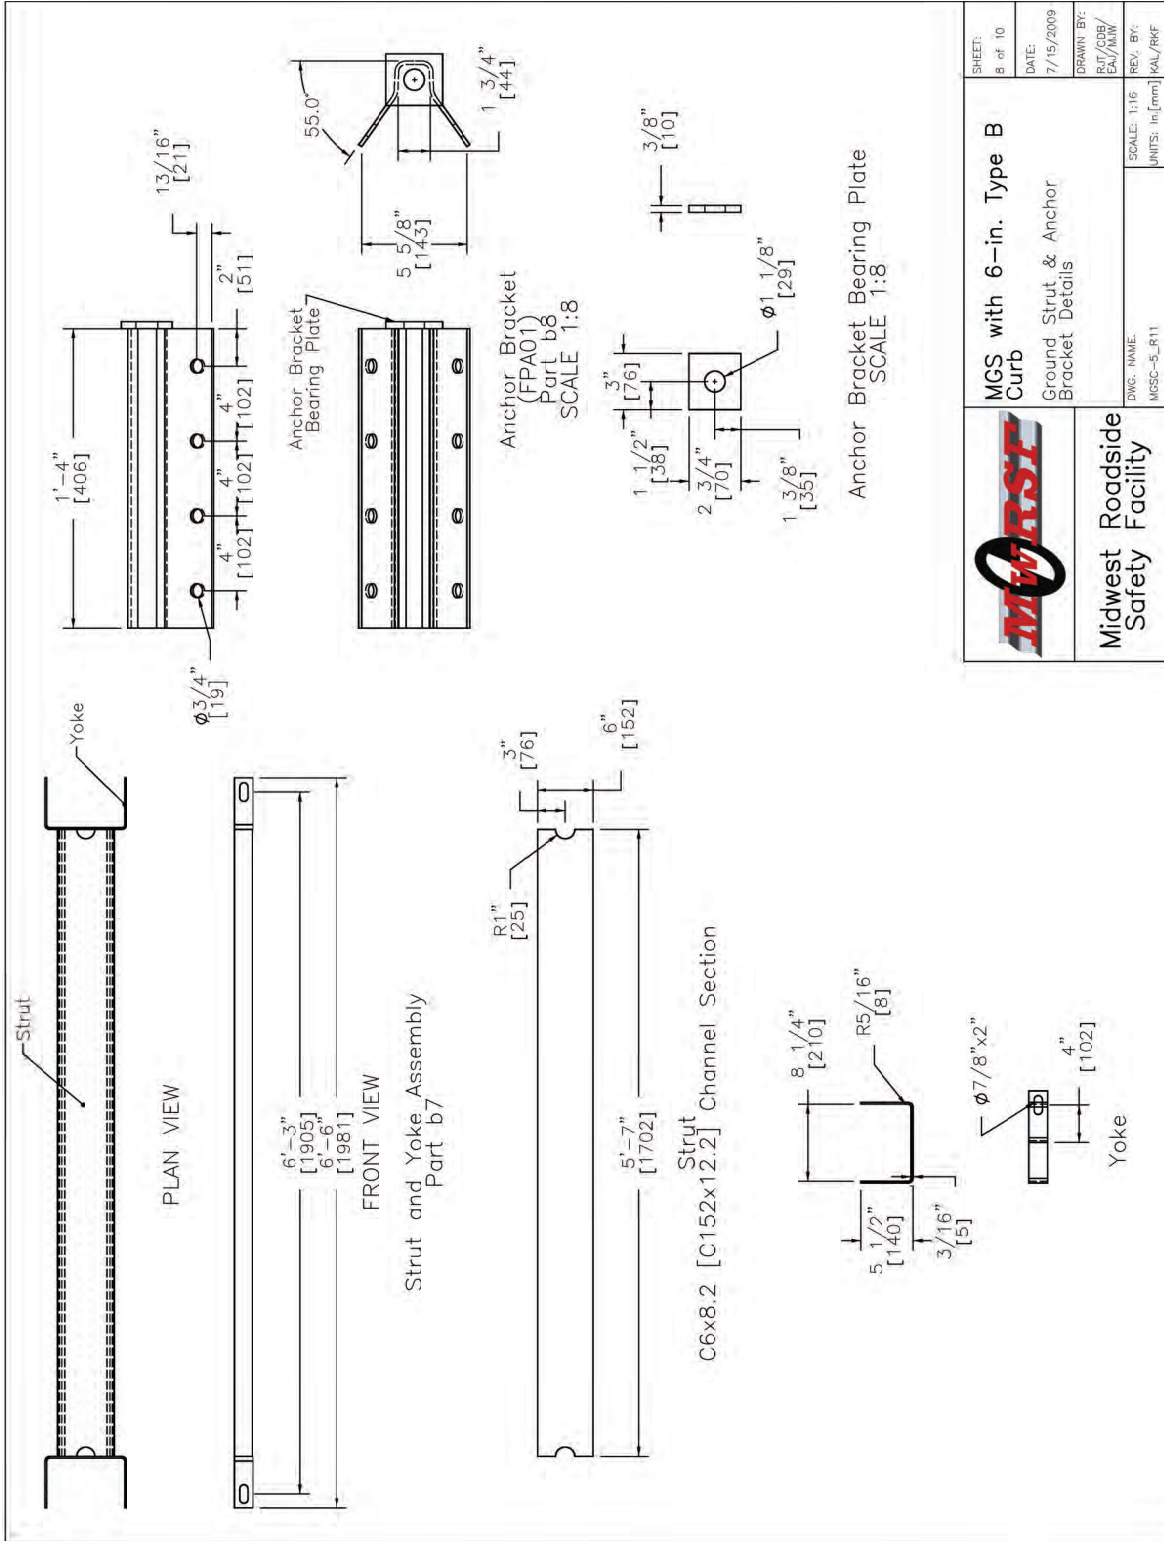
Ground Strut and Anchor Bracket Details, Test No. MGSC-5
